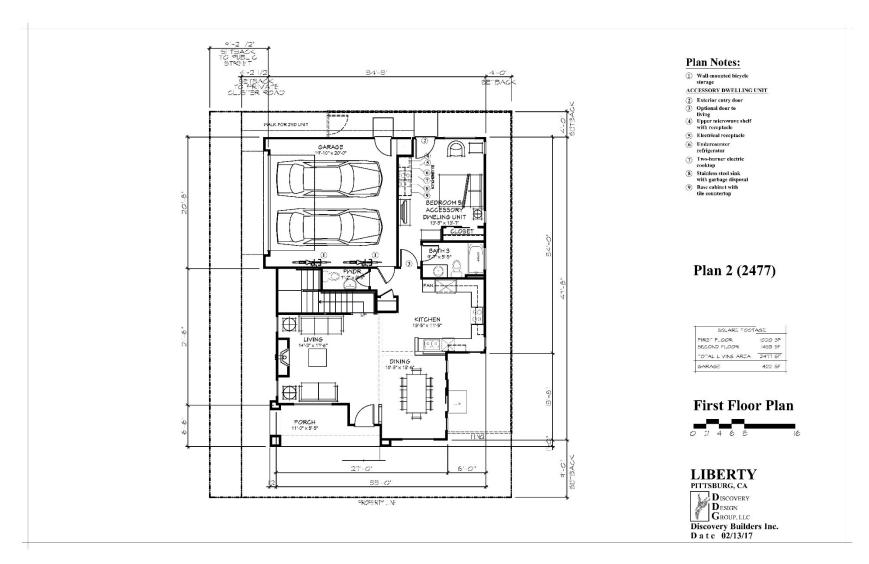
Sample Home Floor Plan with Accessory Unit (First Floor)
